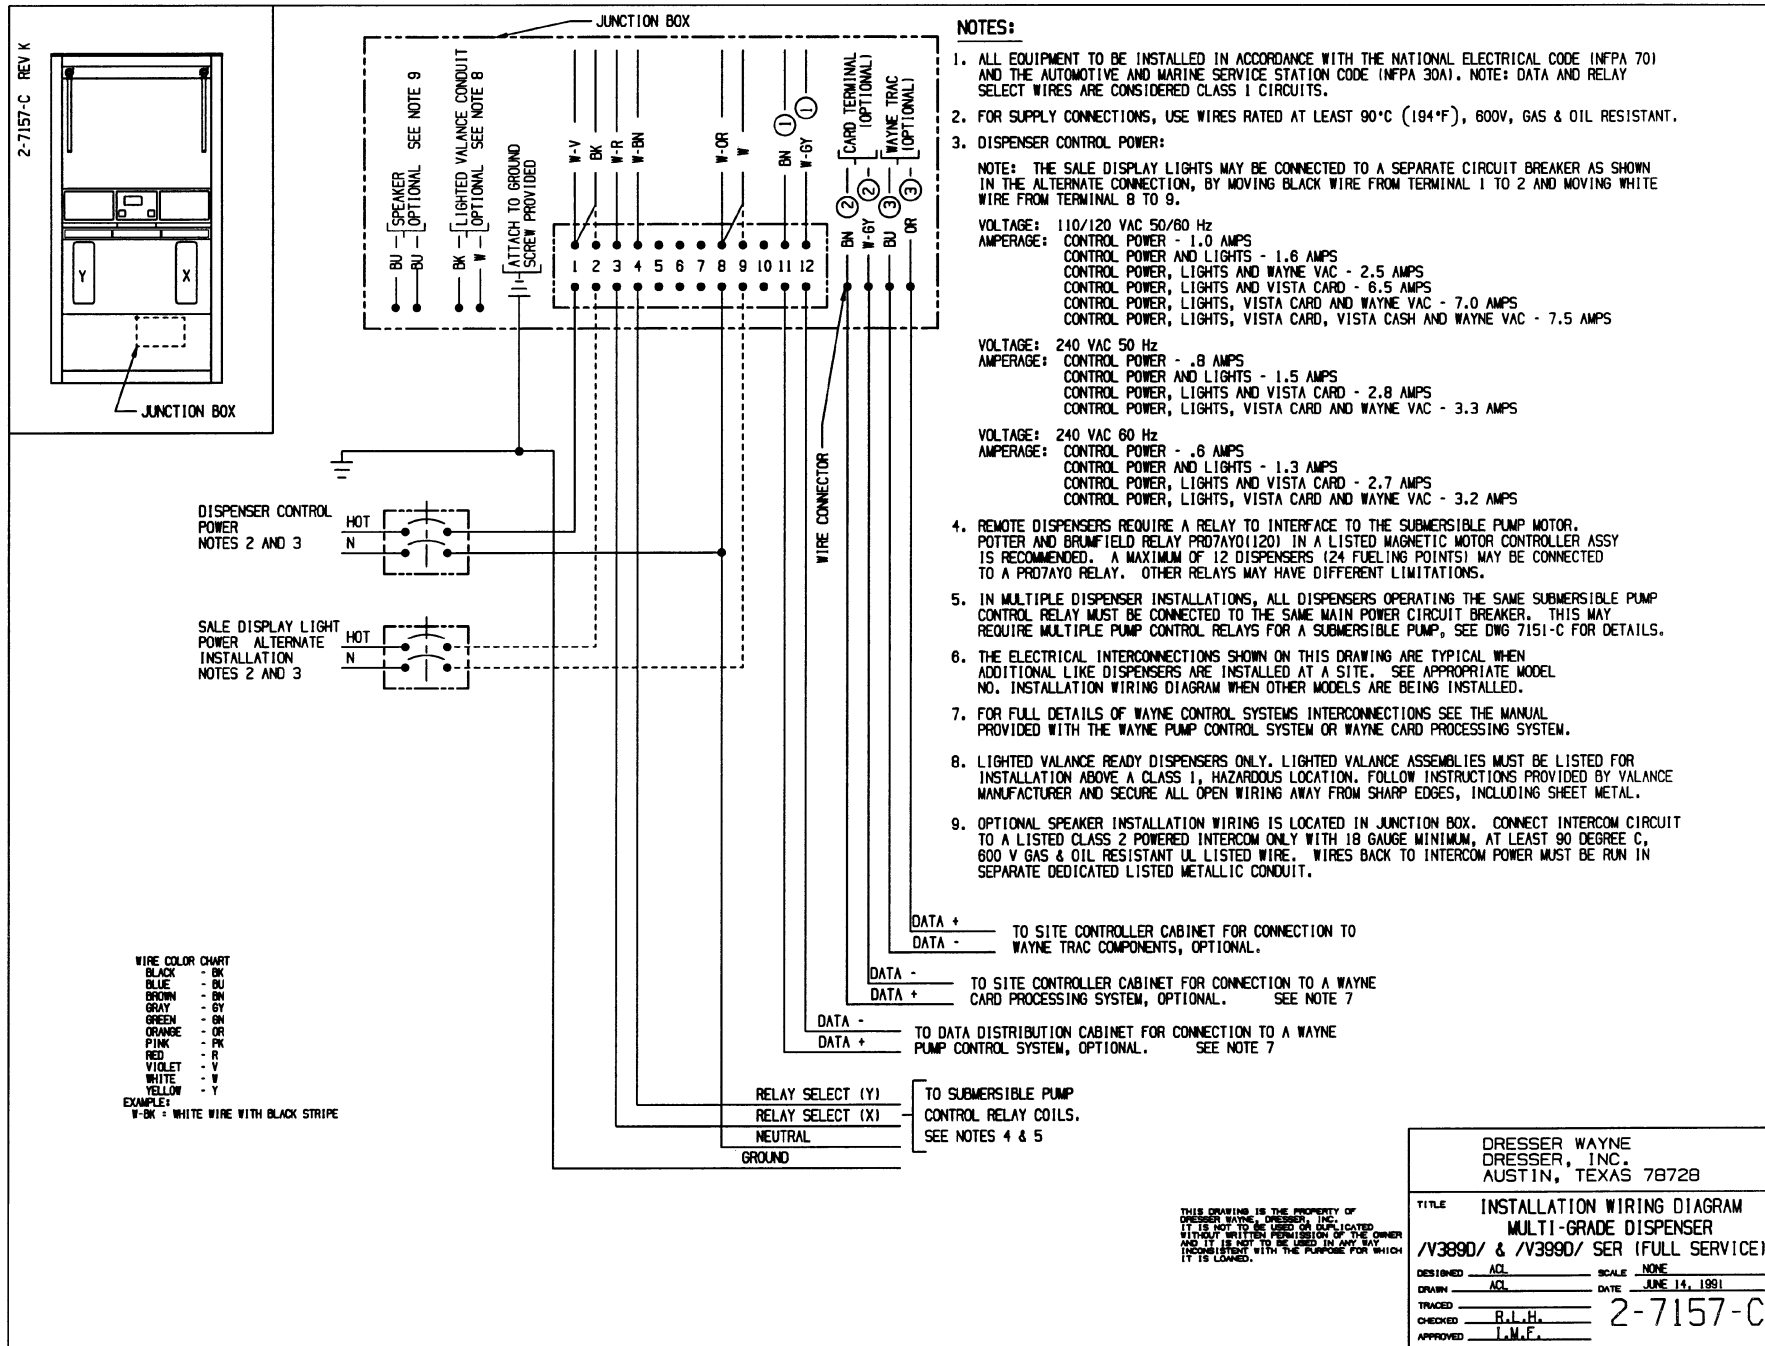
2-7157-C Installation Wiring - 3/V389D and 3/V399D (Remote)
